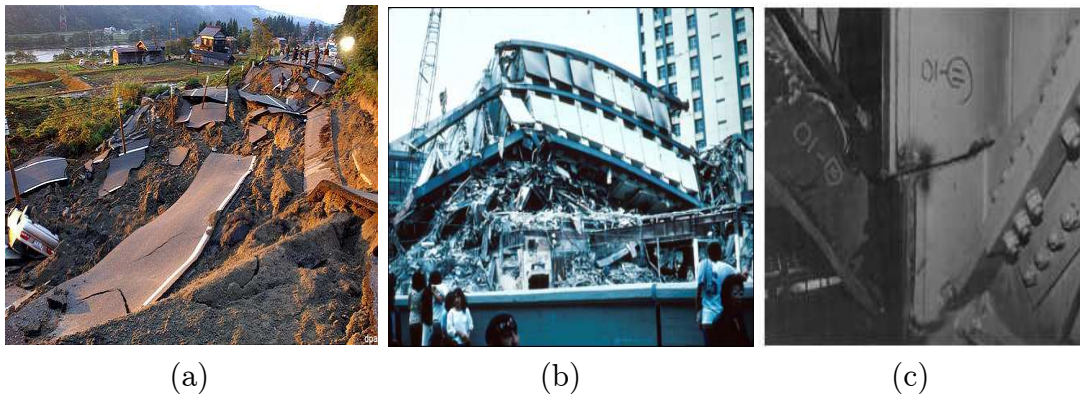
(a) road damage after surface deformations due to an earthquake in Japan in 2004, (b) collapsed steel building after the Mexico City earthquake in 1985, (c) steel fracture in brace to column connection after the Kobe earthquake, 1995
